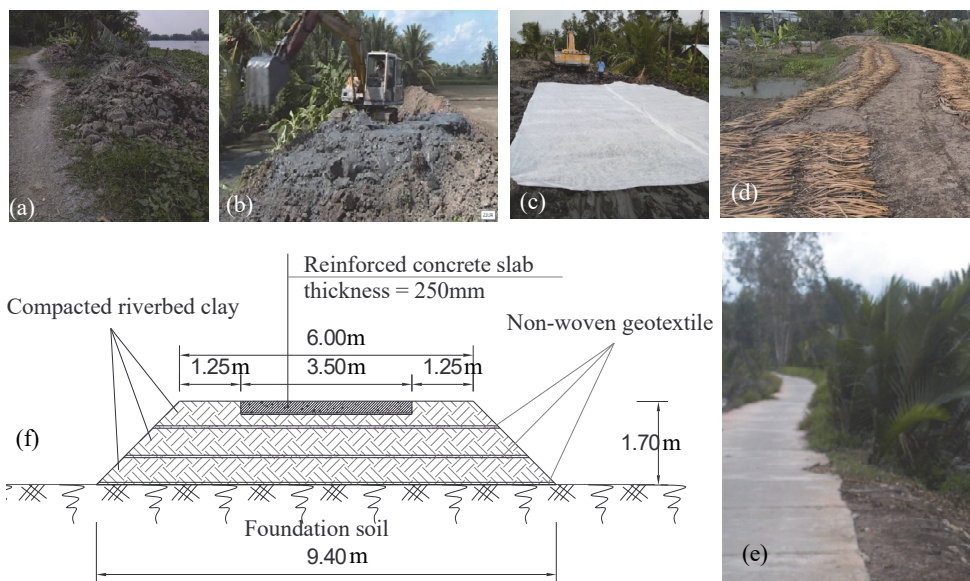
Geotextile reinforced clay for rural road construction in Kien Giang Province, Vietnam; (a) before construction; (b) riverbed clay excavation; (c) compaction and reinforcement placement; (d) finish reinforced clay foundation; (e) completed road; and (f) cross-section design
